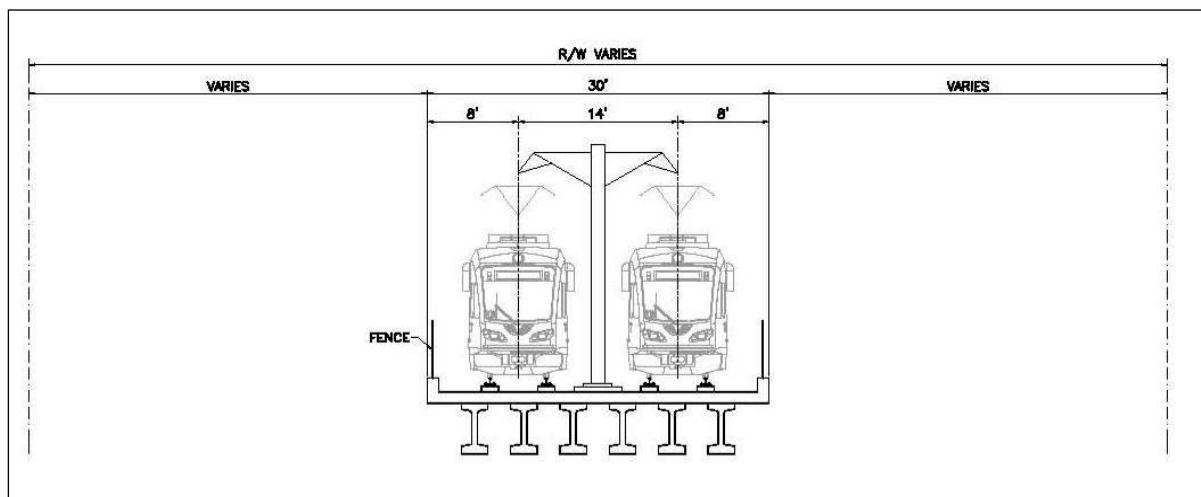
LRT Guideway – Embedded Track – Typical Structure
